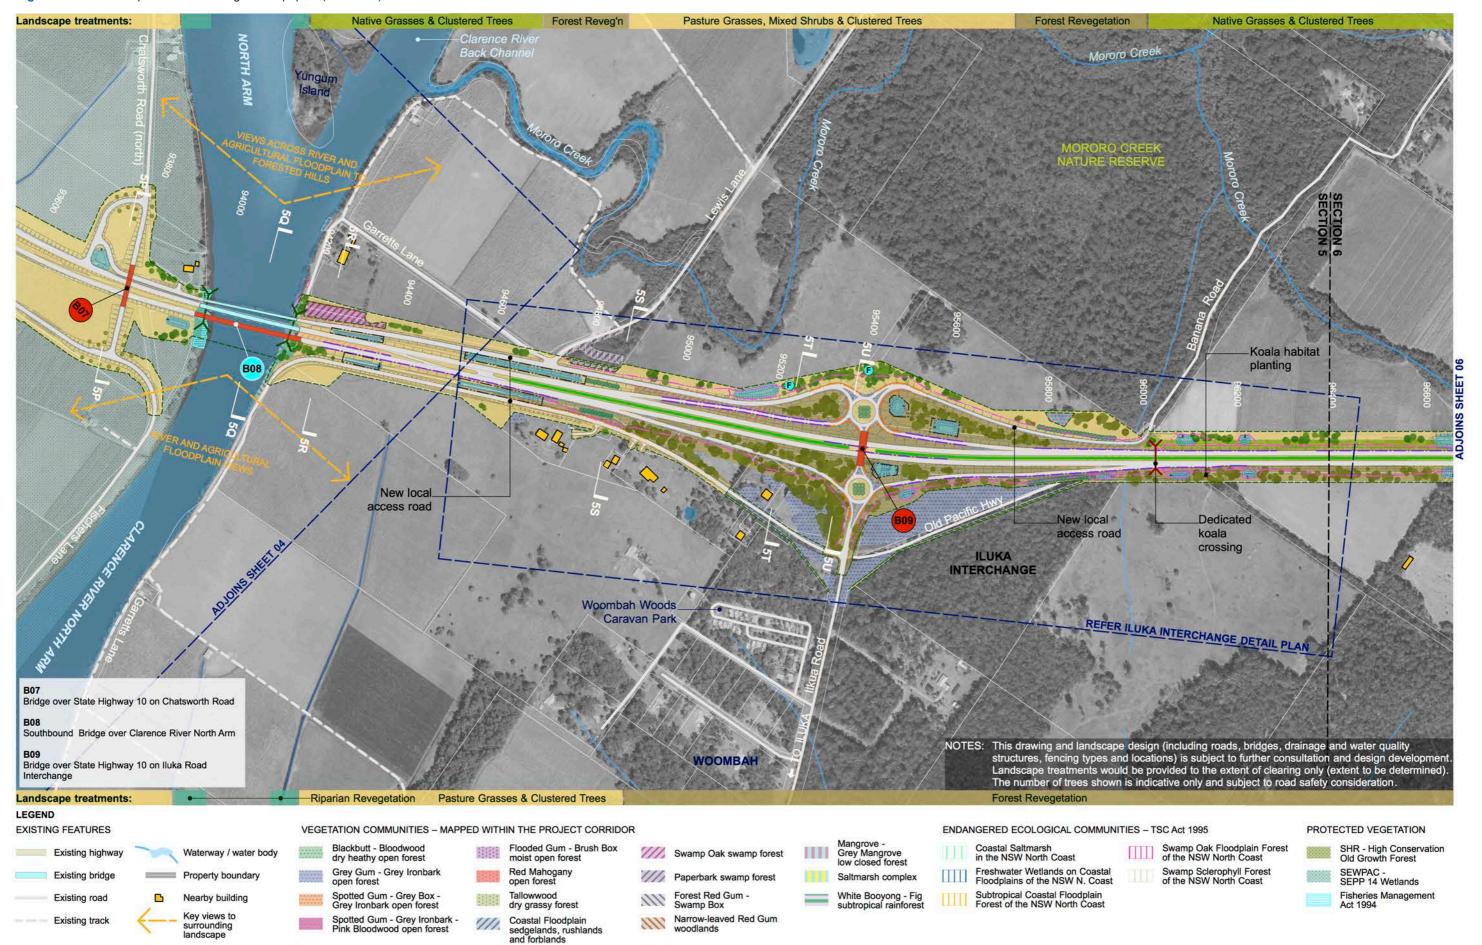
Landscape and urban design concept plan (10 sheets)
